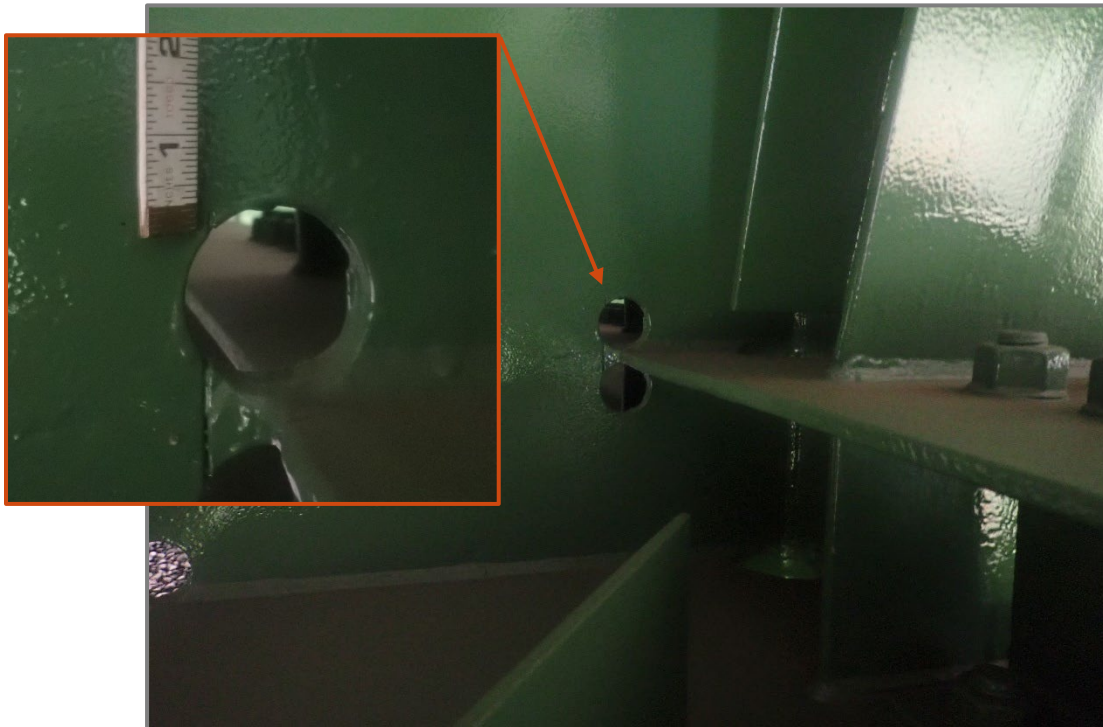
Typical dogbone retrofit overcut in the girder web, looking north at Girder B at Floorbeam 4. Note that some overcut locations are not visible due to the new paint system.
